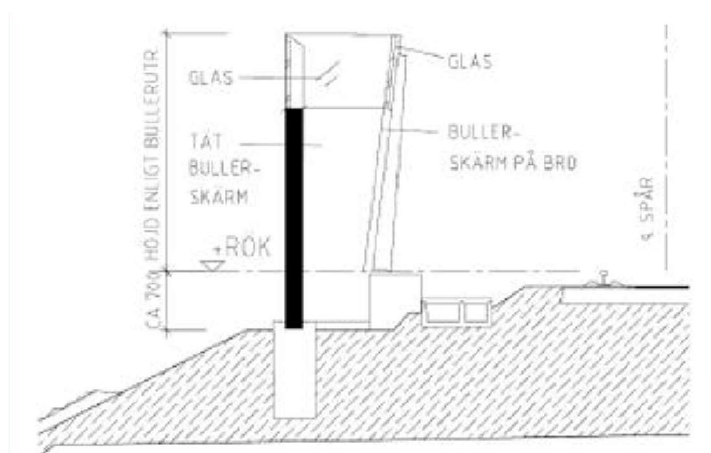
4 Schematic section of noise barrier on embankment, connection to bridge. Note: the figure illustrates a principle, not a technical solution.
